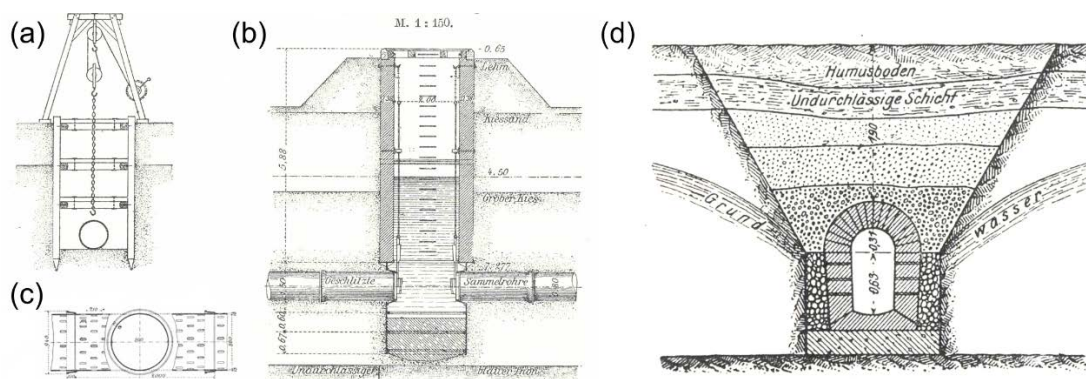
Left: drainage trench built for the water supply of Hannover, Germany, 1878, with (a) trench support (timbering), (b) collector shaft, (c) perforated pipe (modified after Houben 2019). Right: (d) drainage ditch with concrete seepage tunnel, several layers of gravel pack and an impermeable cover layer (Heilmann 1927). Humusboden = top soil, undurchlässige Schicht = impermeable layer, Grundwasser = groundwater.
